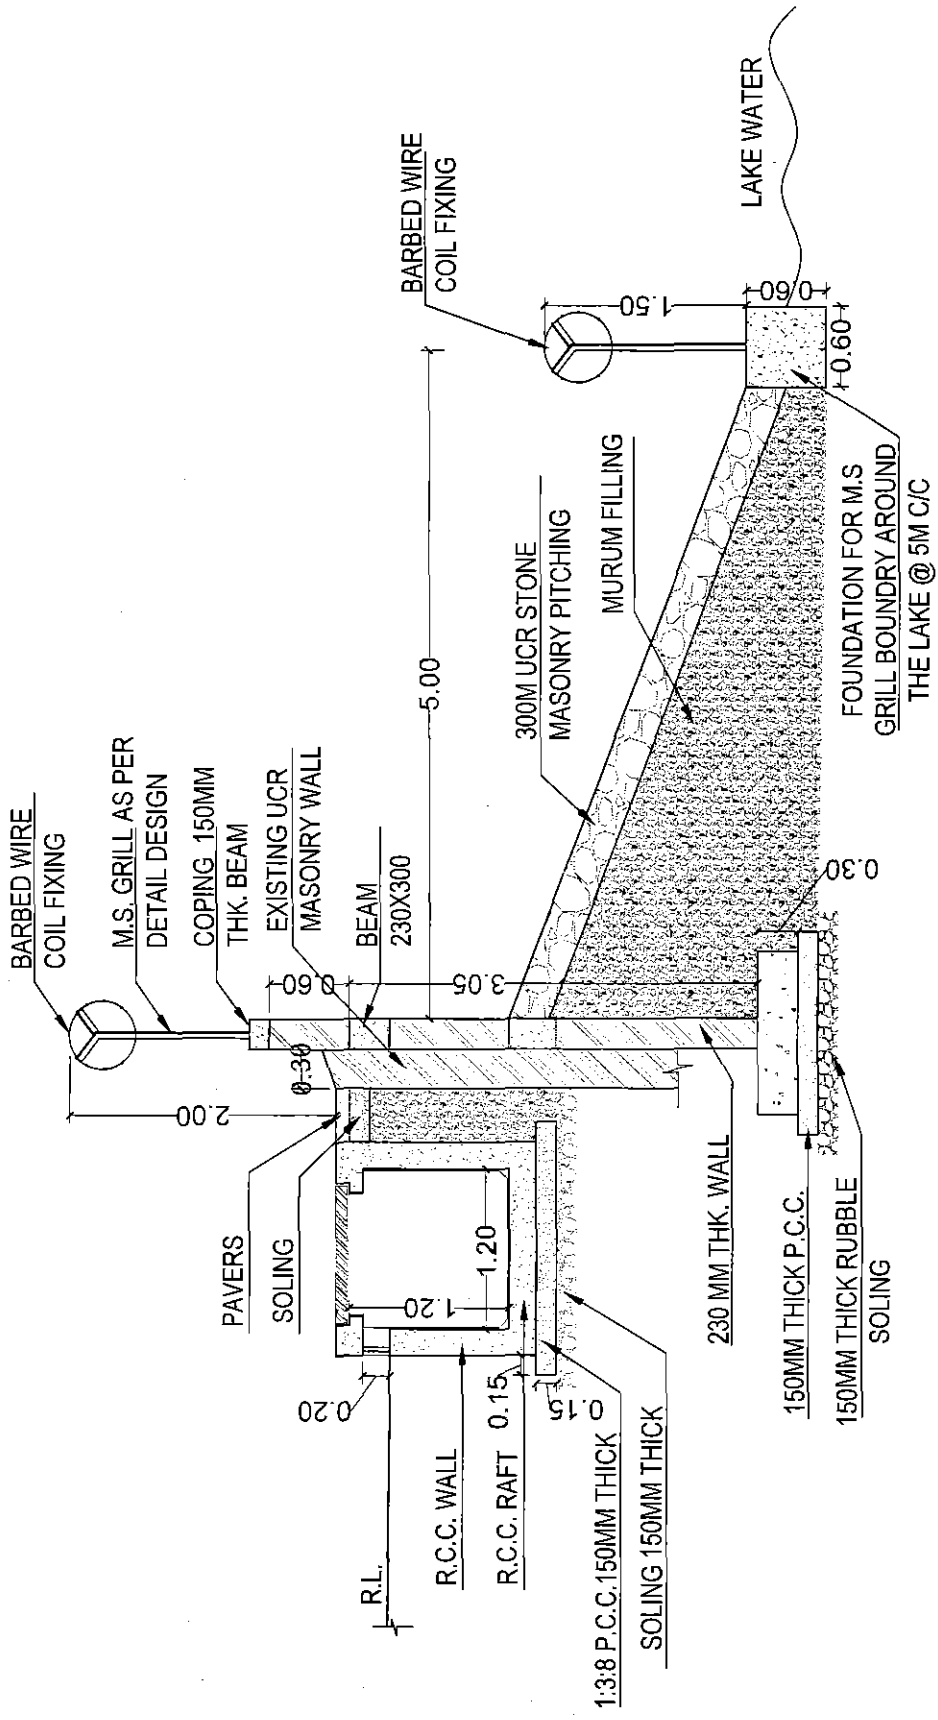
DETAILS DRAWING FOR DEVELOPMENT OF VARLADEVI LAKE AT BHIWANDI – MAHARASHTRA.
